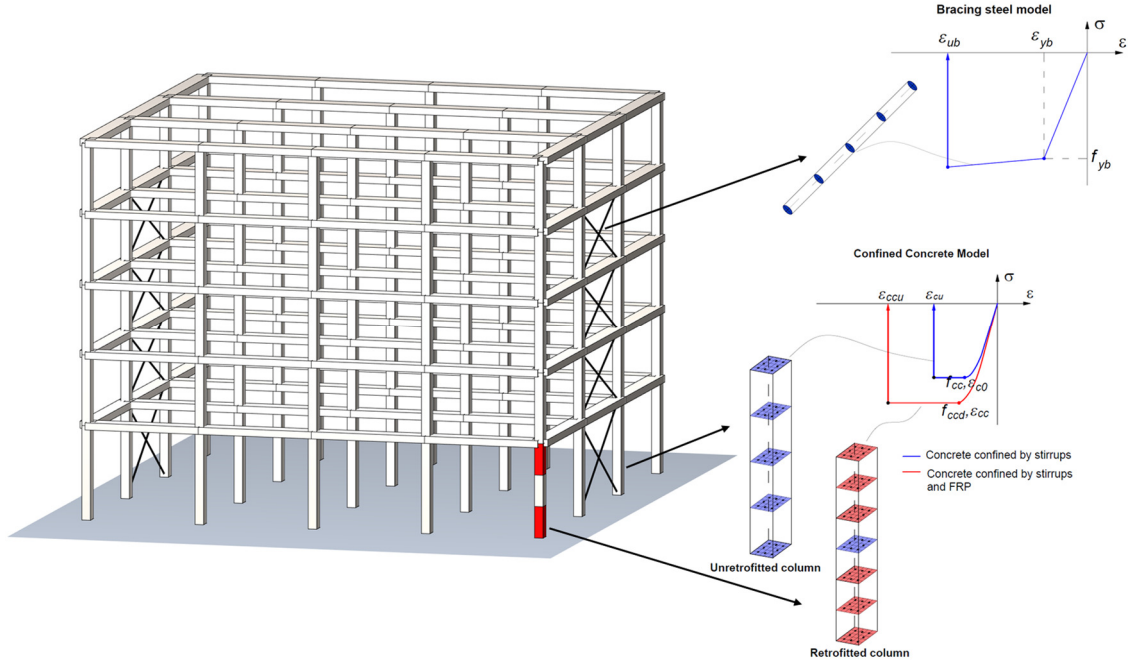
Definition of the fiber-section elements in OpenSees, concrete elements with and without FRP wrapping and steel bracings.
